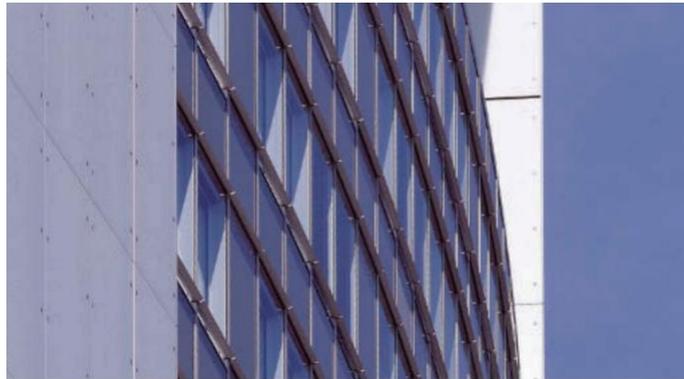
Detail of 125mm ventilation slot with aerofoil strip protruding top and bottom
